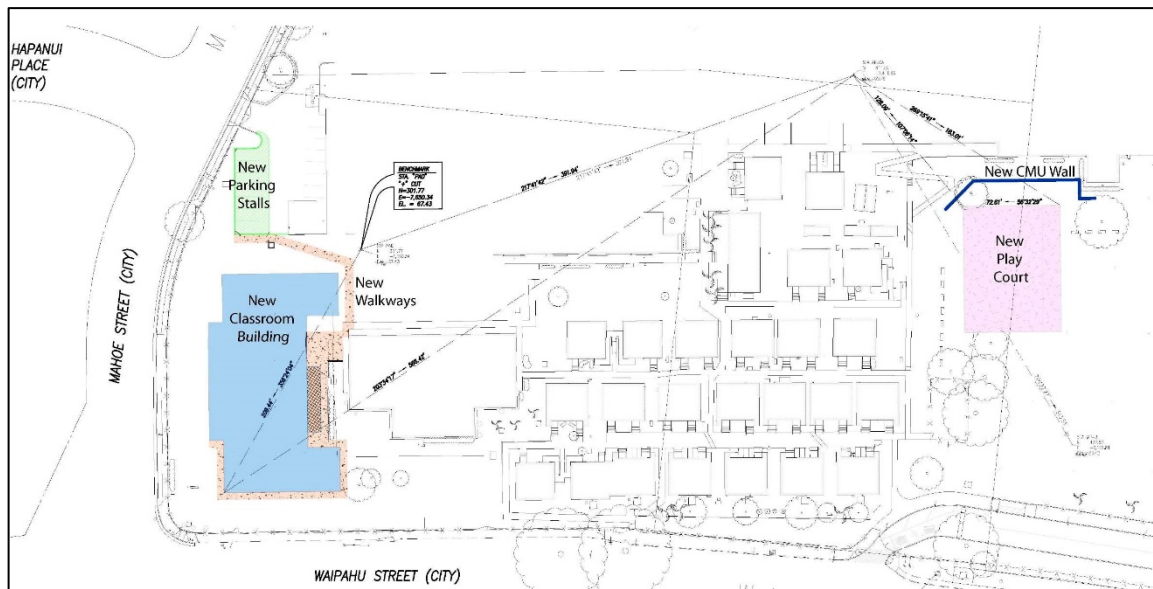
Portion of August Ahrens Elementary School campus showing locations of proposed additions and improvements.
